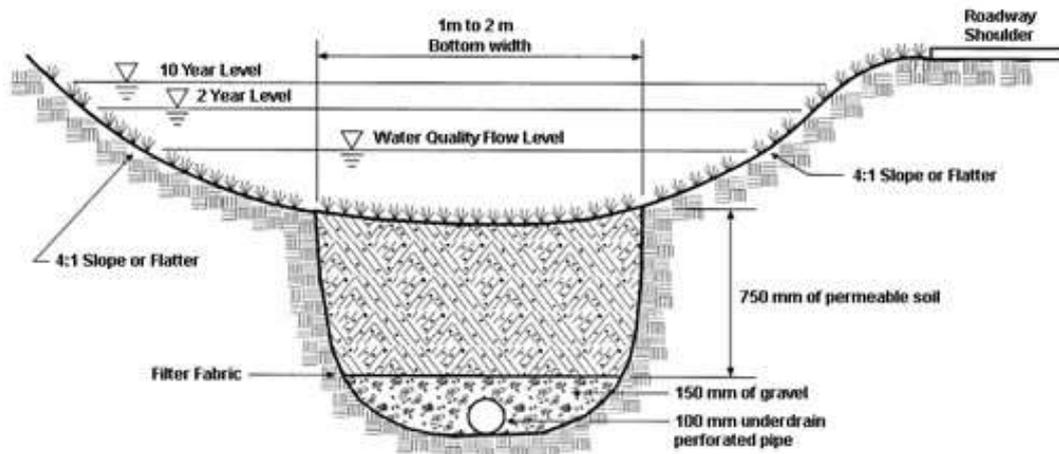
Swale schematic showing soils and underdrain¹⁰⁰
